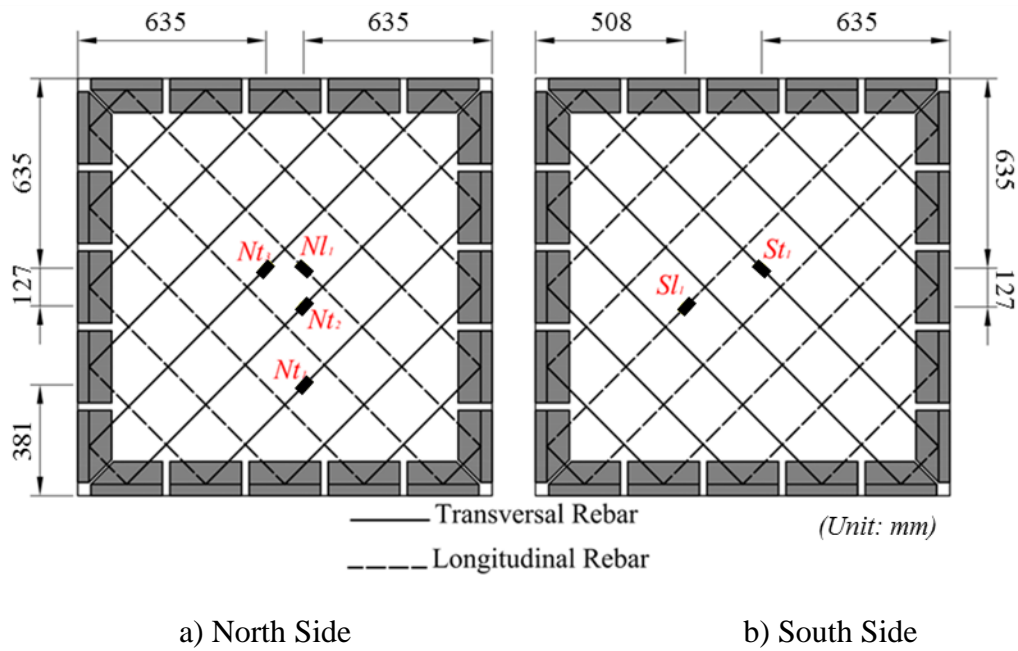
Strain gauge layout on steel rebar of panel specimens
